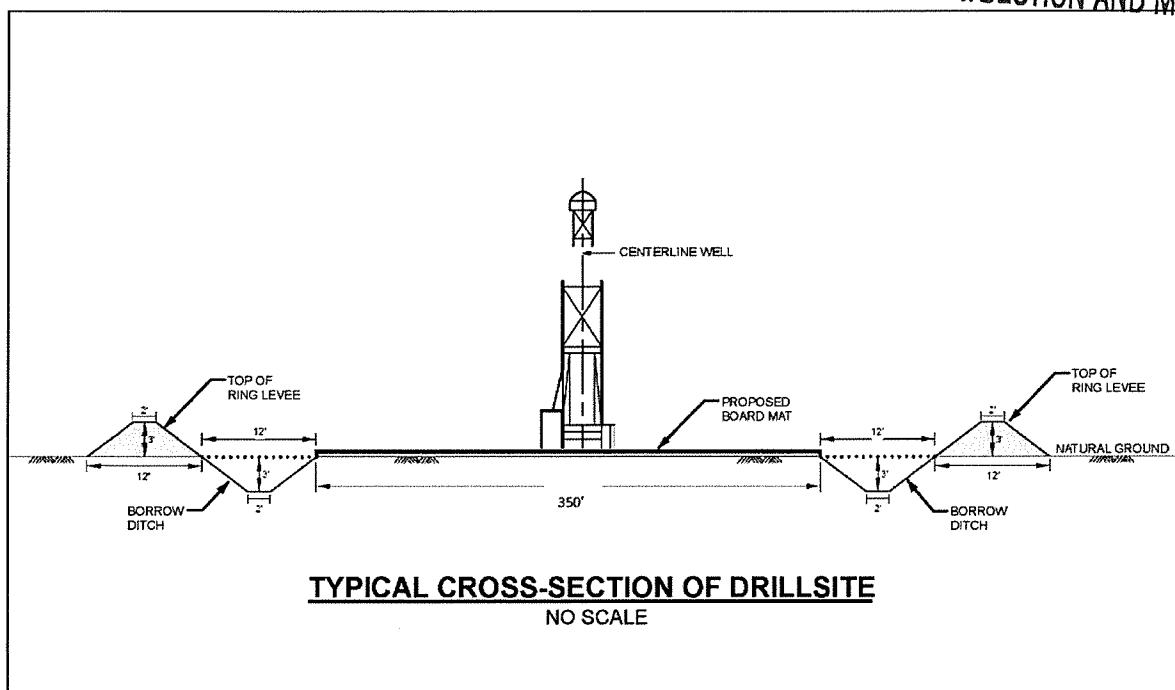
Typical Cross-Section of Drill Site with Ring Levee
